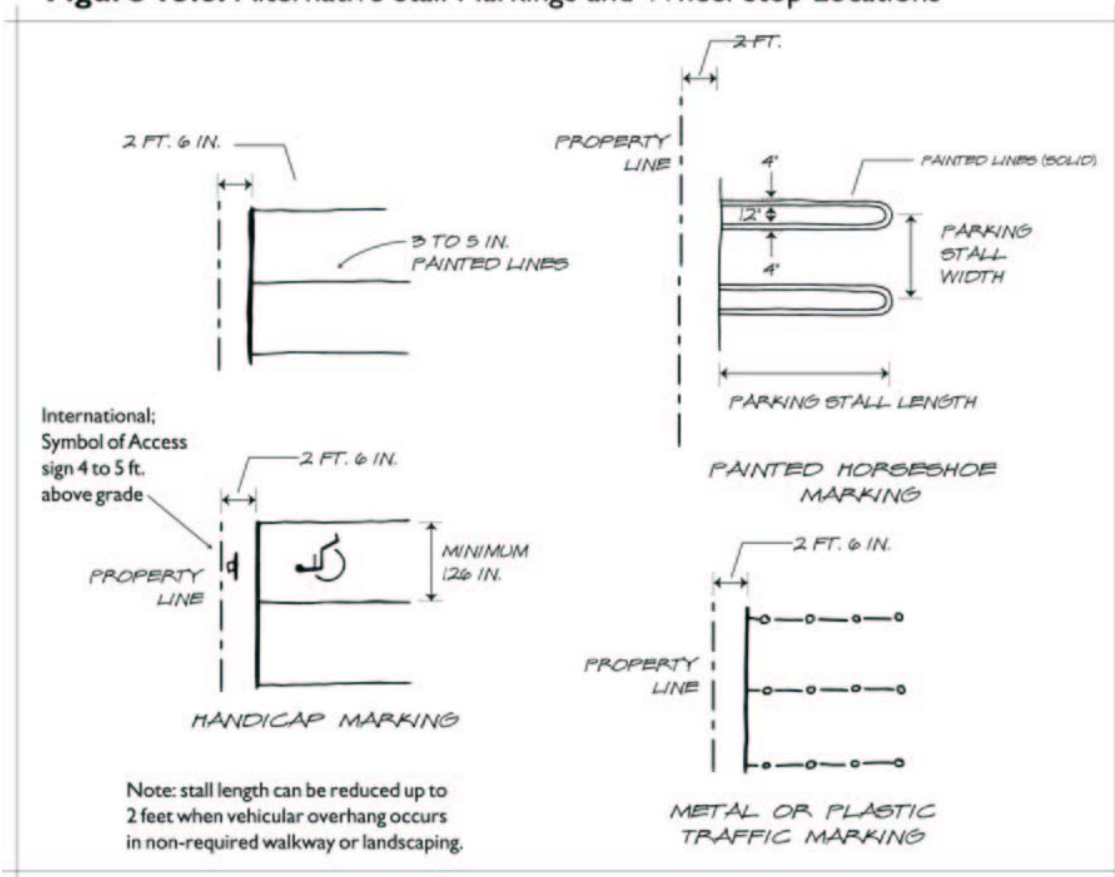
Alternative Stall Markings and Wheel Stop Locations
